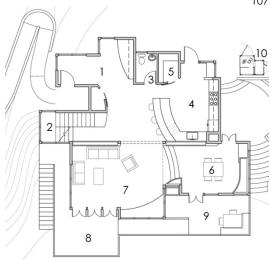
First Floor Plan - 1. Entry 2. Stairs 3. Powder Room 4. Kitchen 5. Pantry 6. Dining 7. Living 8. Deck 9. Outdoor Dining
